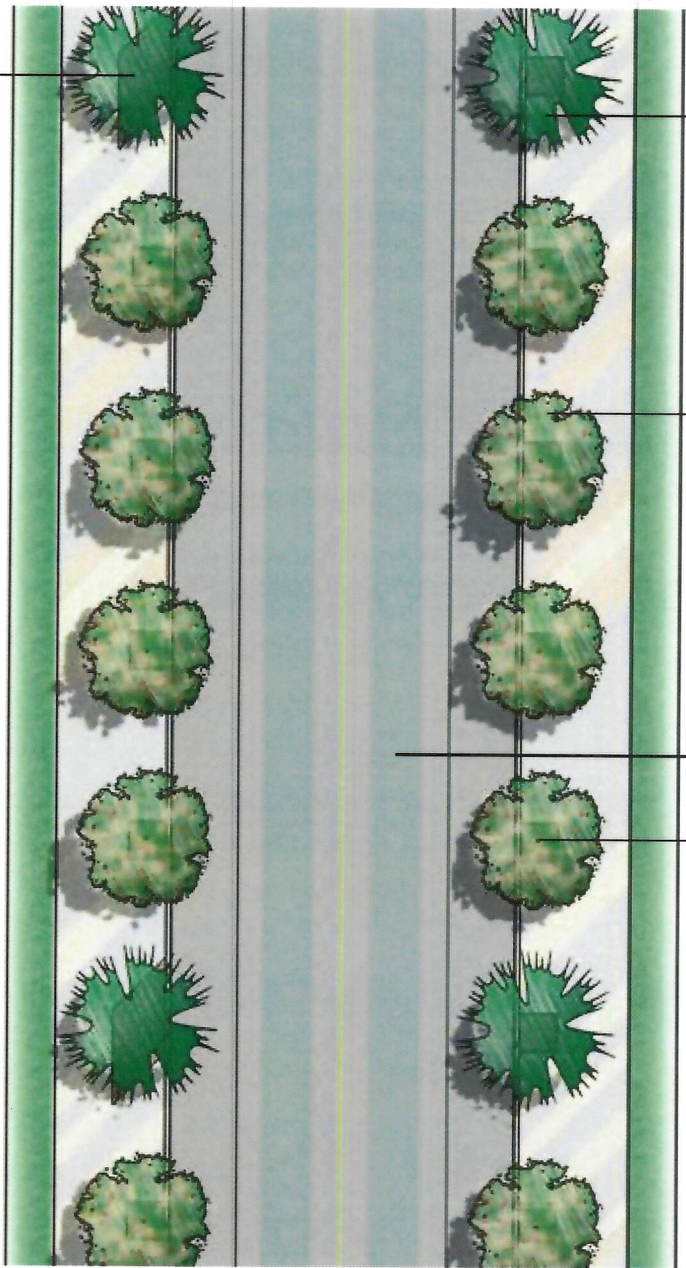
Street Trees: 220th Street (East of Vermont Avenue)
